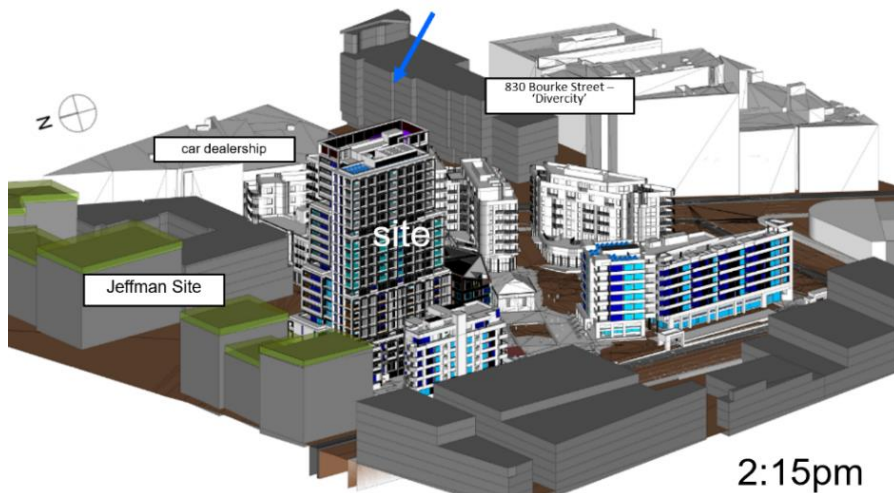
The Tower Building and Bourke Street South Building will overshadow existing north-facing apartments located within the 'Diversity' development from 2:15pm onwards (blue arrow)
